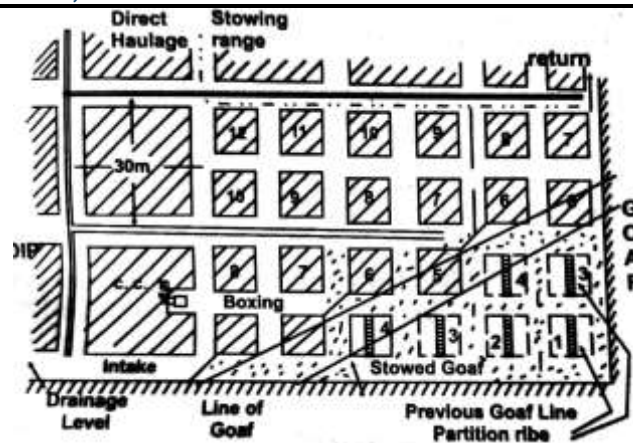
Depillaring with hydraulic stowing. (DJ Deshmukh, vol.1)
